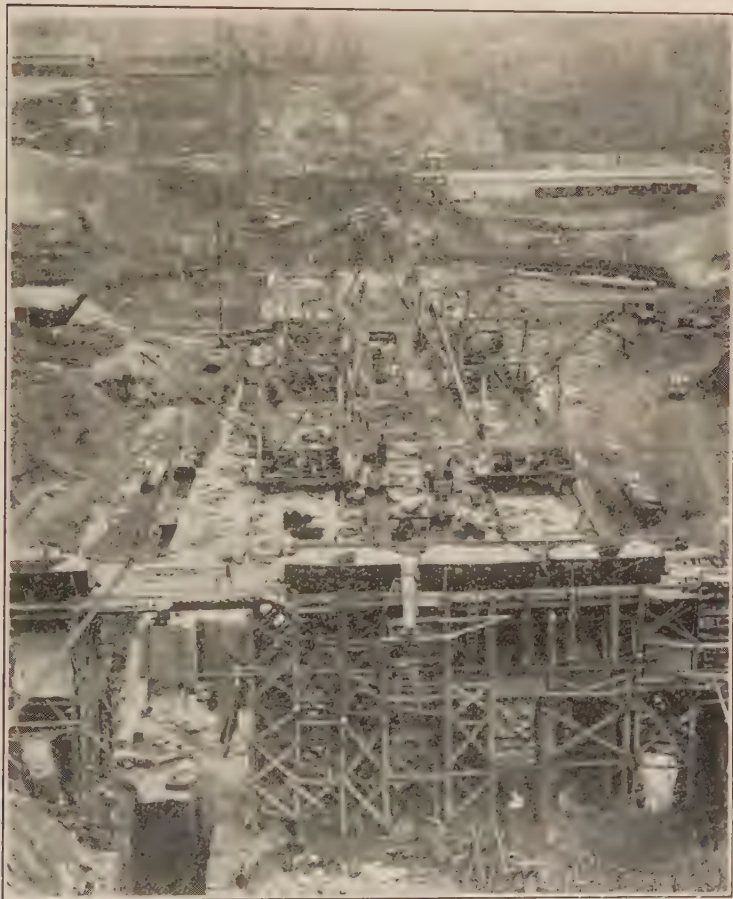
GENERAL VIEW FROM WEST HILL TOWARD EAST HILL.
